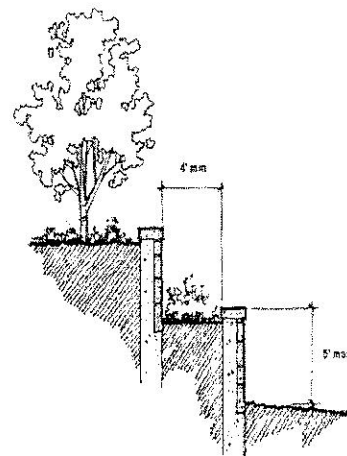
The width of the terrace between any two 5-foot retaining walls shall be a minimum of 4 feet with a maximum slope of 3:1.
